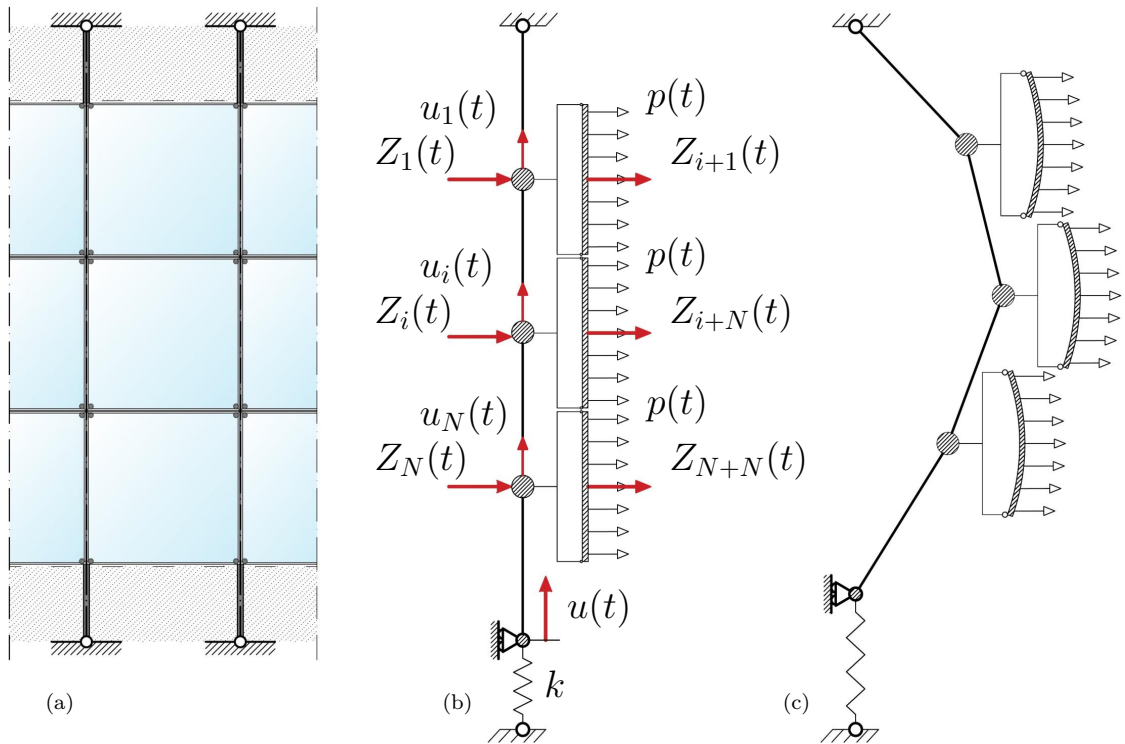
Case study: (a) façade composed of N horizontal rows of glass panels; (b) the (undeformed) simplified $(2N + 1)$ DoF model; (c) deformed configuration of the model.
